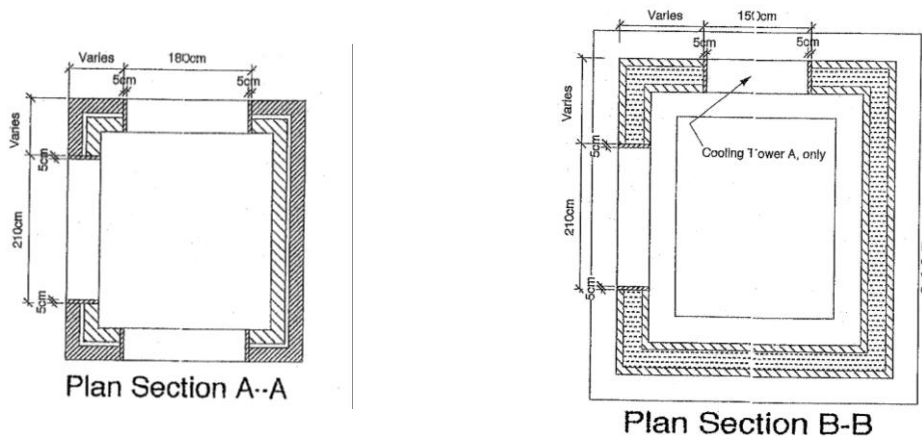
Plan views of tower A at different height level (Tower B similar)
